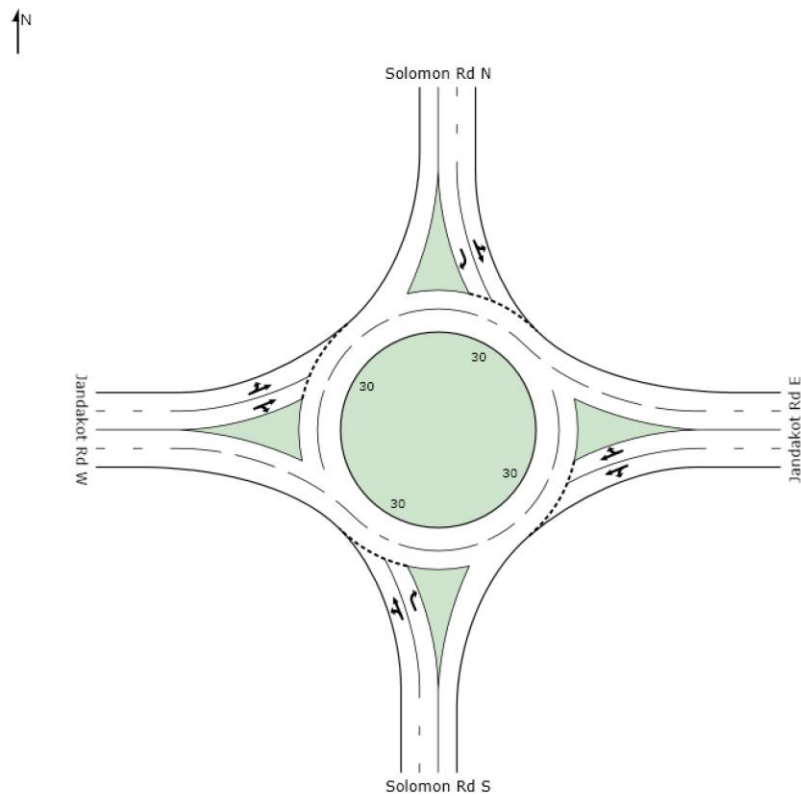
Proposed Roundabout at Jandakot Road/N-S Spine Road
